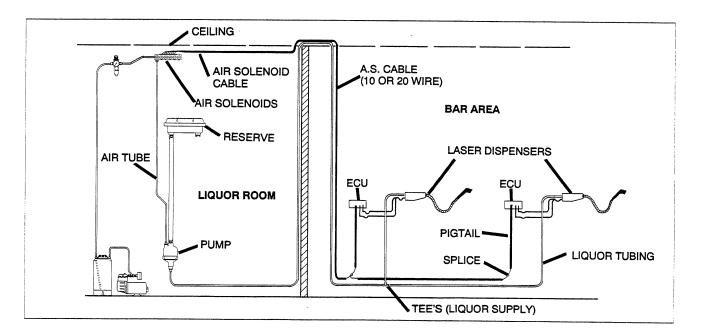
4: Overall view of layout considerations for cable and tubing.
